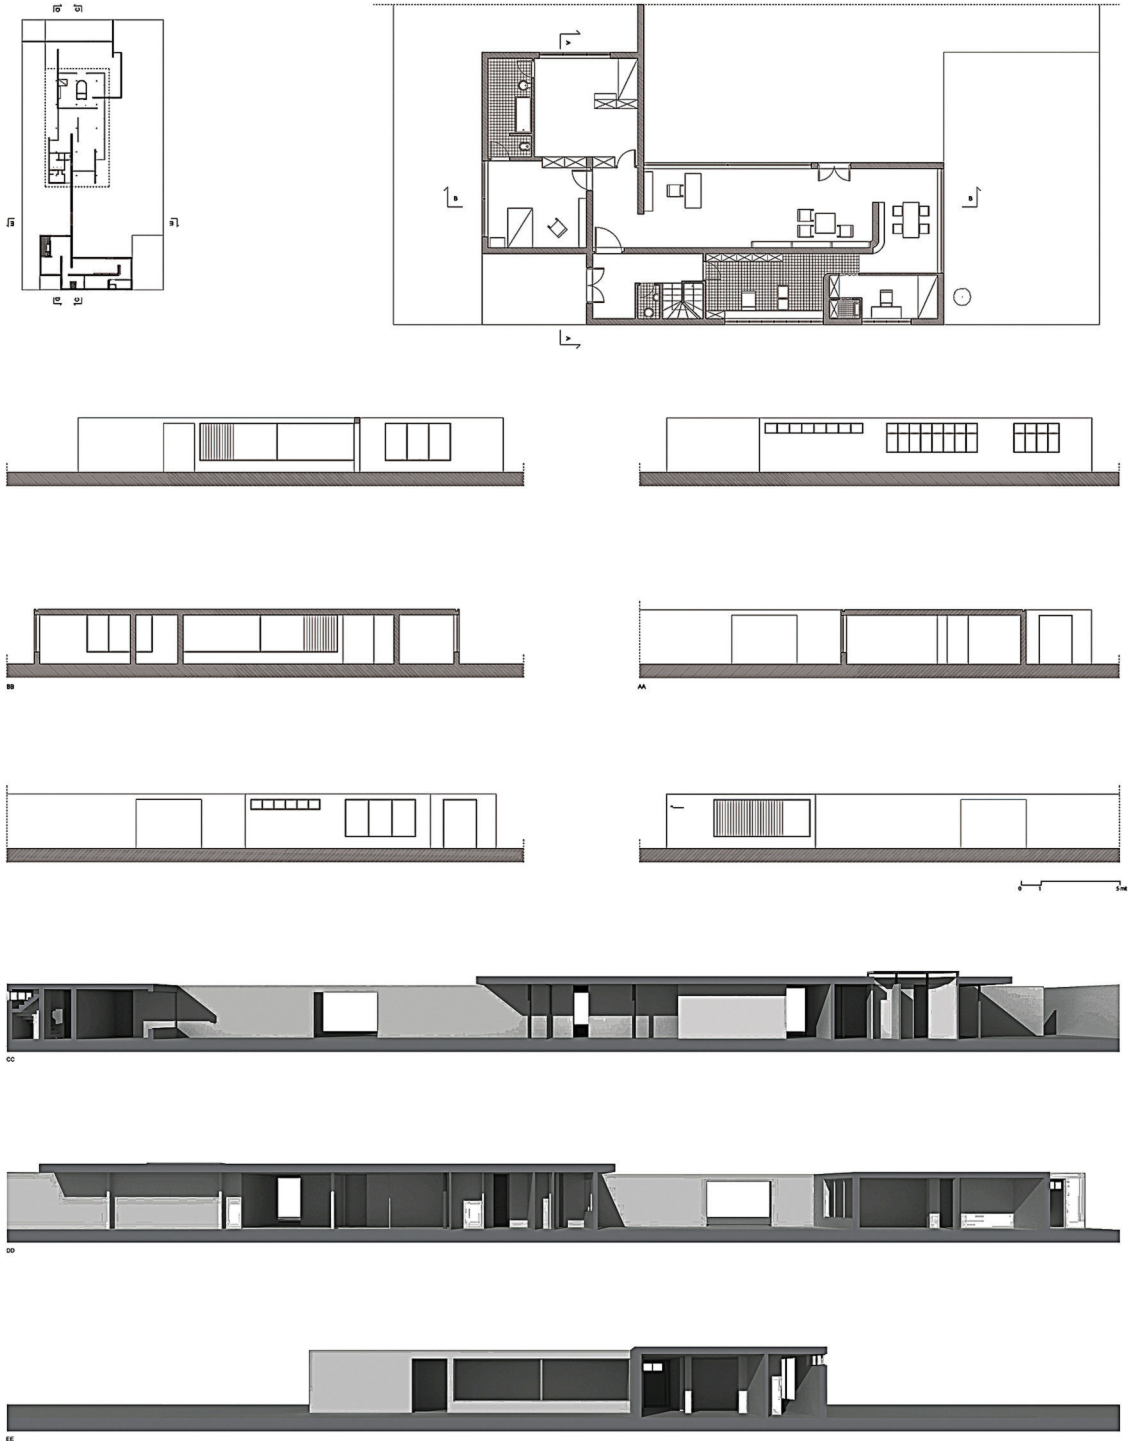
Plan, elevations, sections and sections in perspective (D. Migliore).
